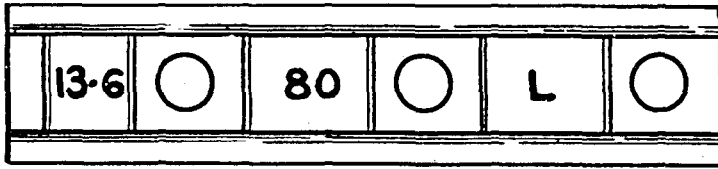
TYPICAL 80 & 100 LB. Y LAYOUT HEEL BLOCK
